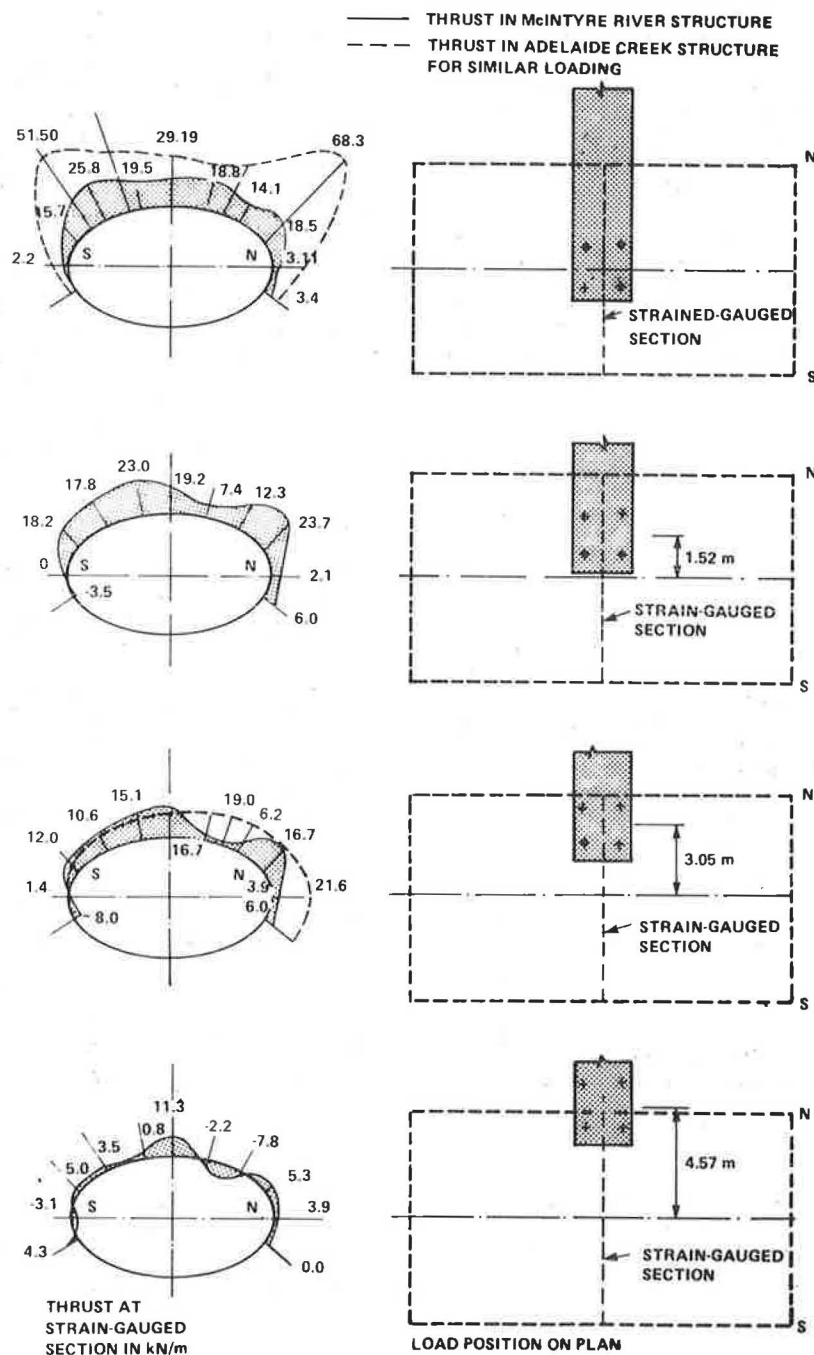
Thrust in conduit wall due to test vehicle 1, load level 3.
